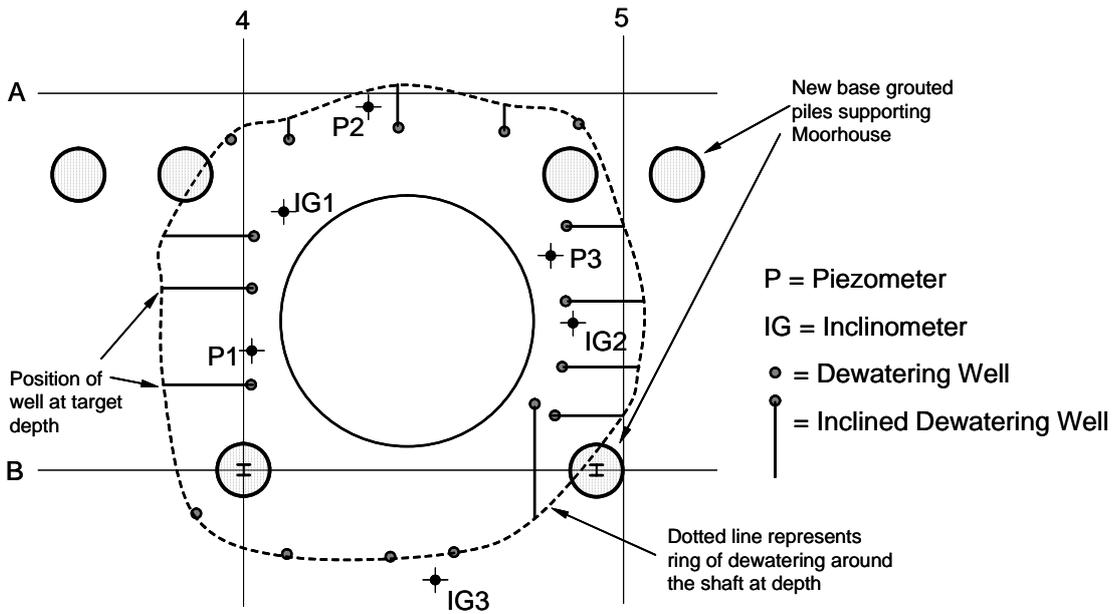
Layout of dewatering wells, piezometers and inclinometers around shaft position
